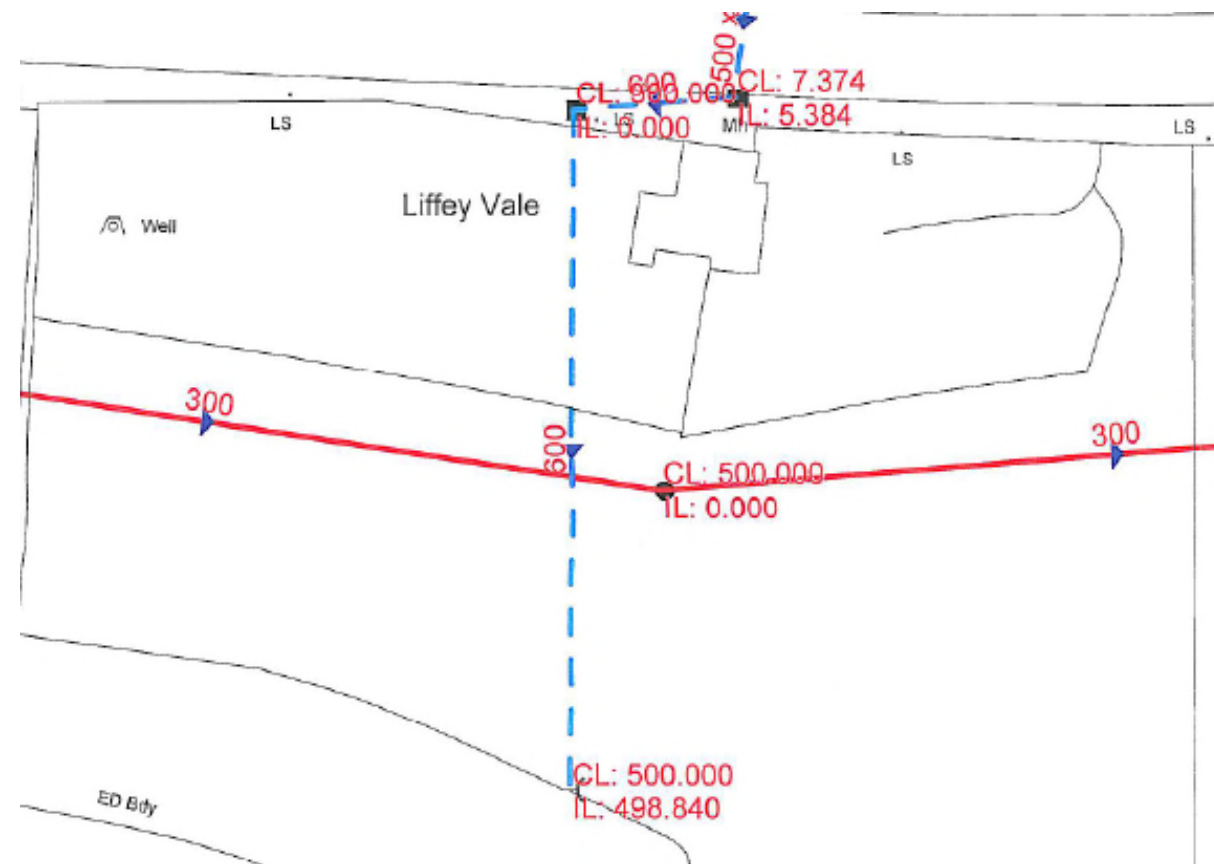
Excerpt from DCC Drainage Record showing Existing Surface Water Drain (blue) and Sewer (red)
